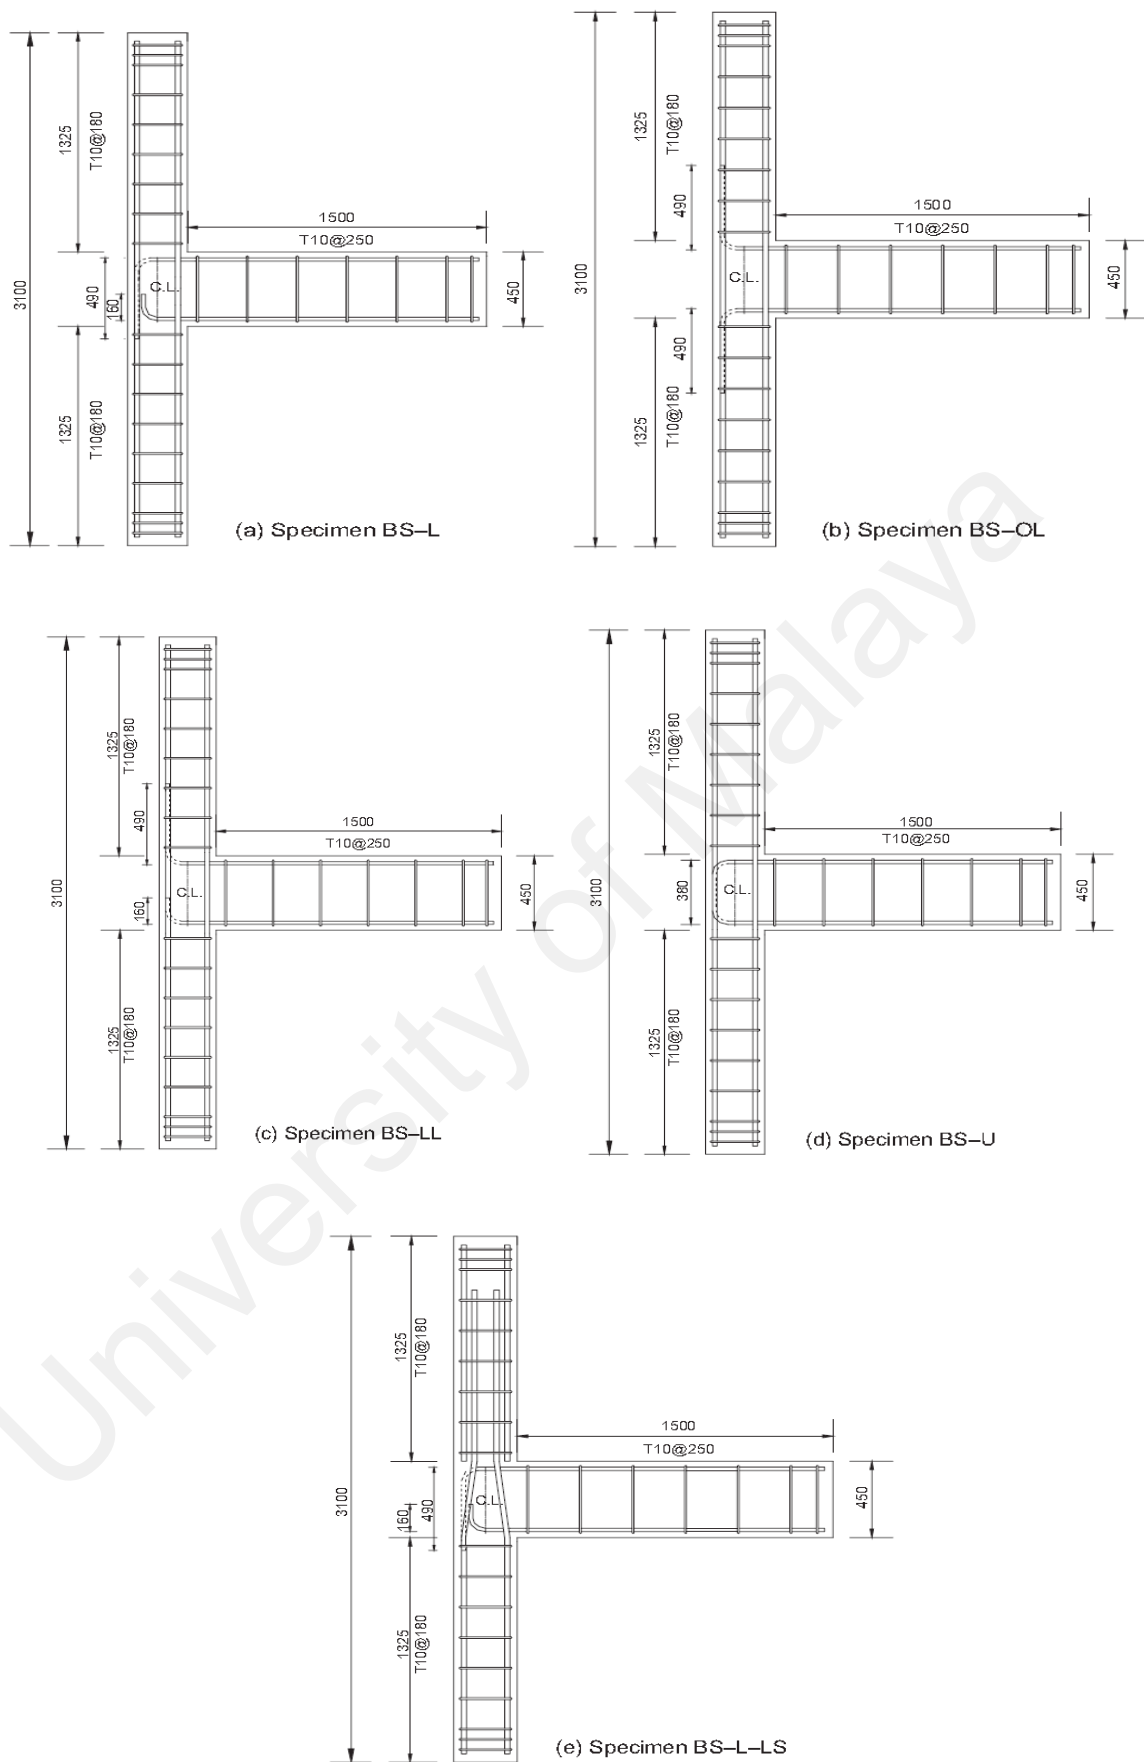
Specimens with different types of beam bar anchorage (Kuang & Wong, 2006)
